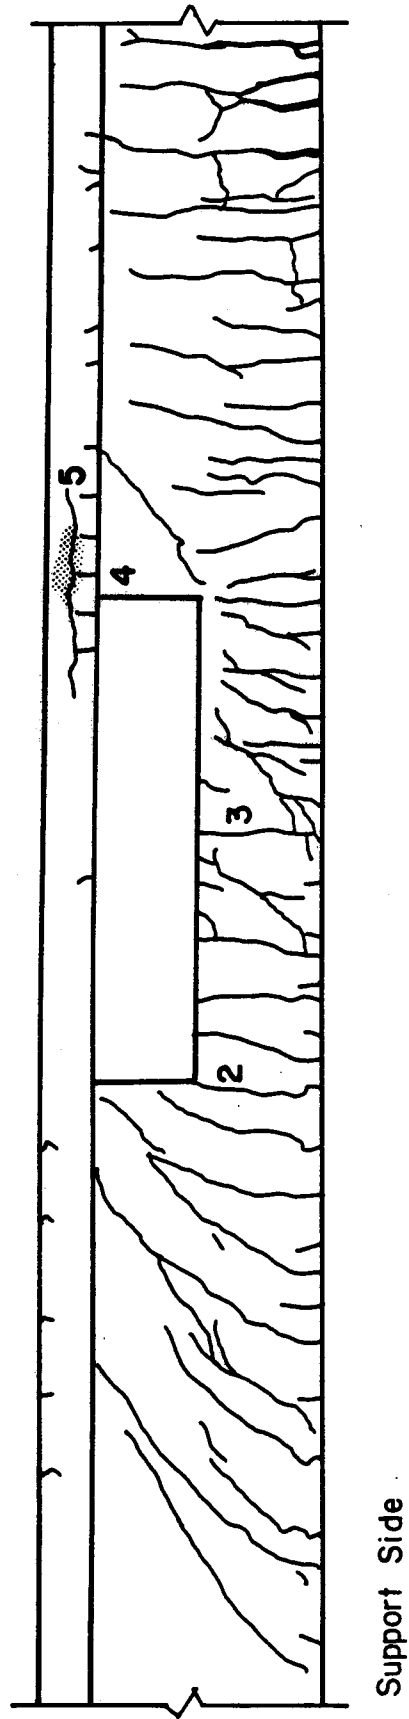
Crack Pattern - BEAM D2.
